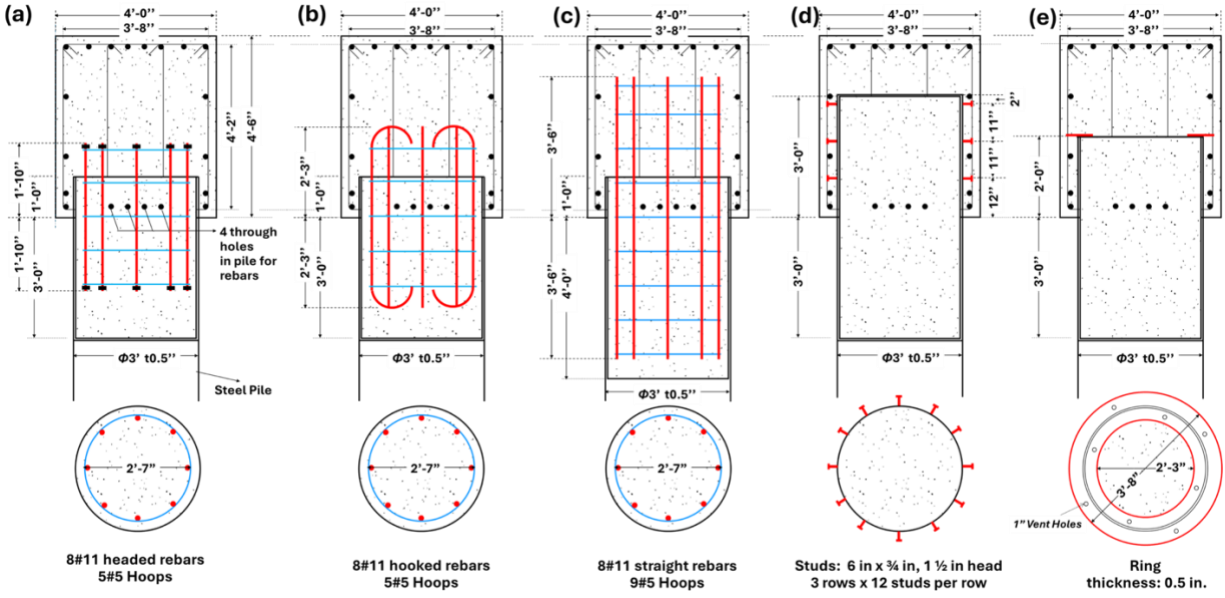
Specimen Connection Design and Drawings—(a) Headed, (b) Hooked, and (c) Straight, (d) Stud and (e) Ring.
